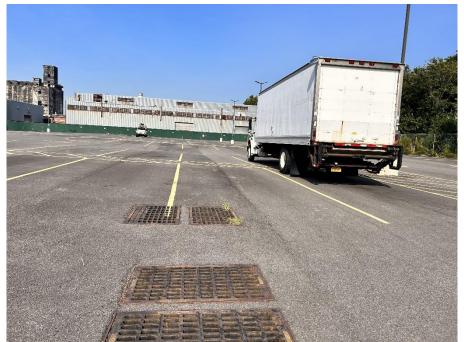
Storm drains and remaining vehicle from previous tenant vehicle in the central part of the site (facing west).
